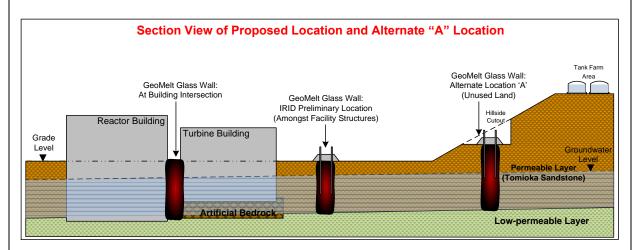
Preliminary and Alternate "A" Location for GeoMelt Wall (glass wall to right) as well as the plant perimeter glass wall and intra-building glass water stop (see also Kurion IRID Task Area 4 response)
